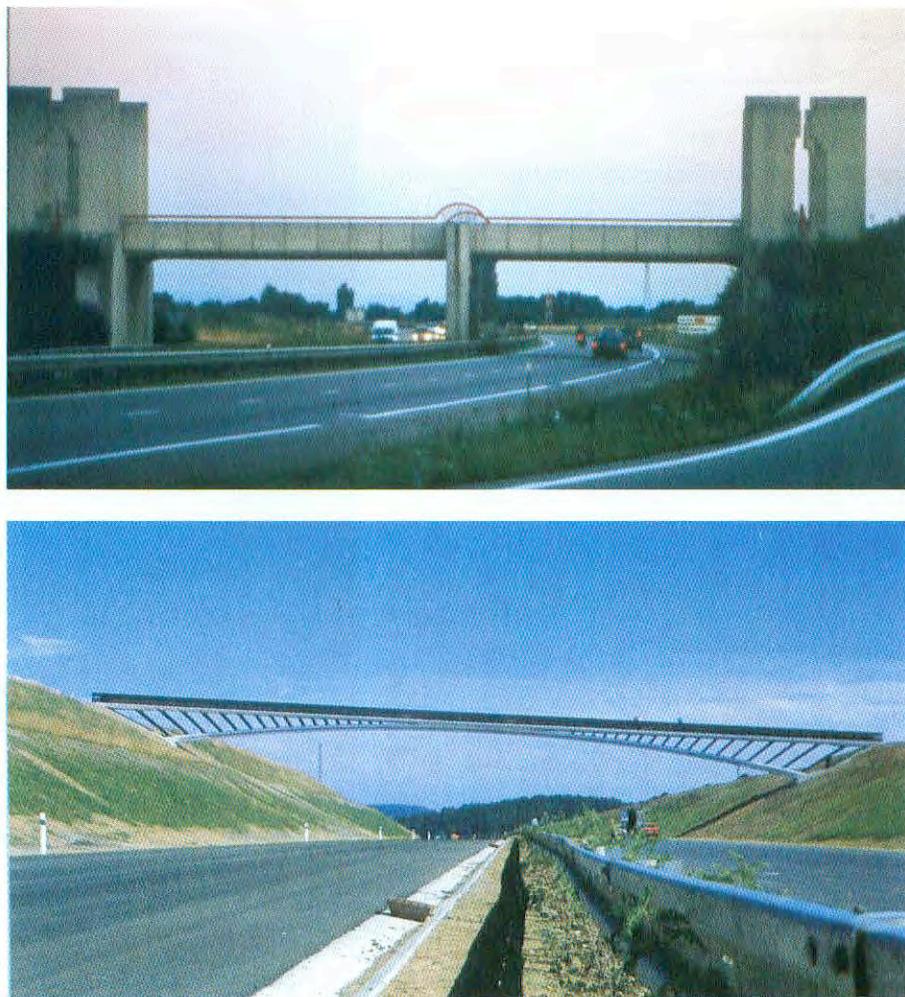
Contrast between artificial poor decoration and structural beauty[3], [19]
